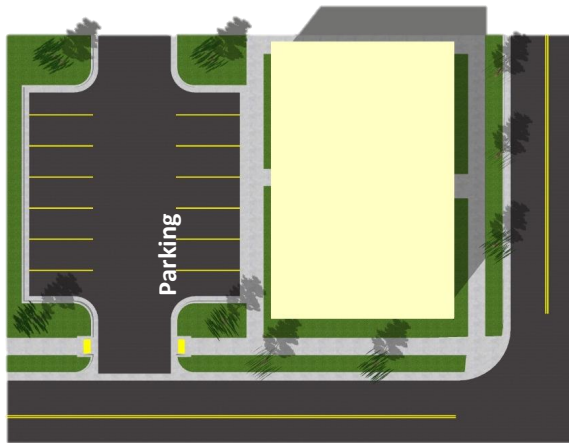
Parking area is located behind the building with an entrance facing and connecting to the public sidewalk.
